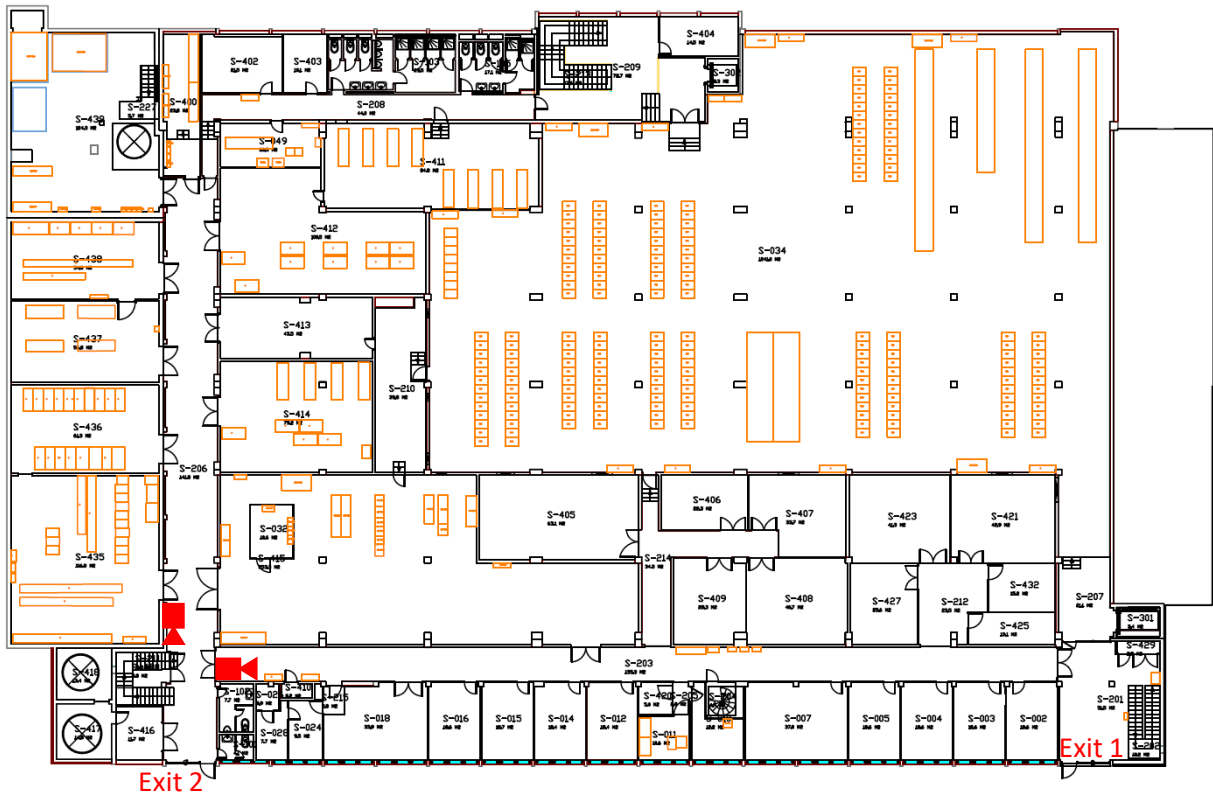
floor R-1 layout, the locations and orientations of cameras, and the locations of emergency exits within this floor – building 2
